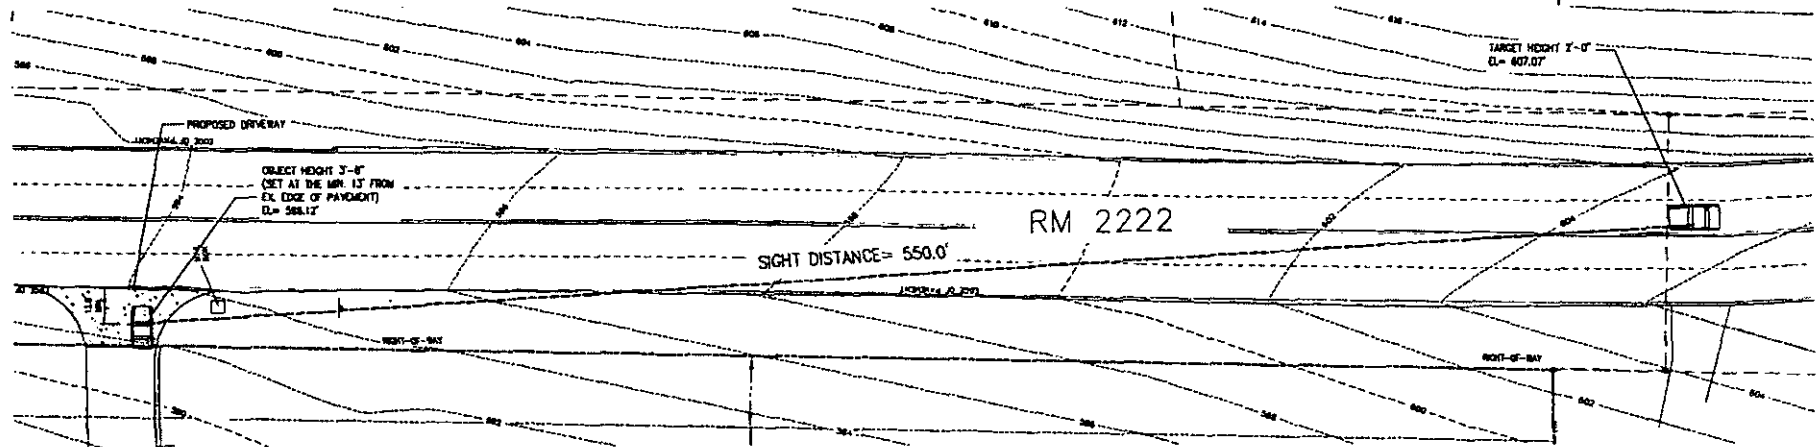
EXHIBIT M - DRIVEWAY DETAILS - (3 of 5)
